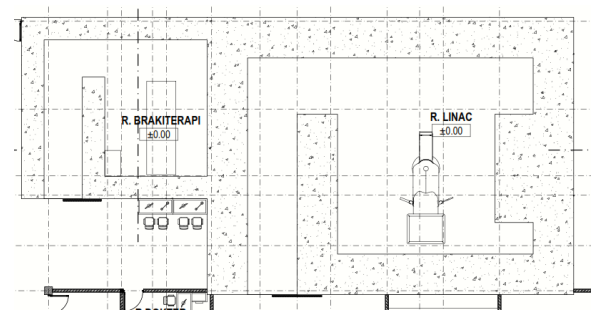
Layout of the LINAC and Brachytherapy Bunker
